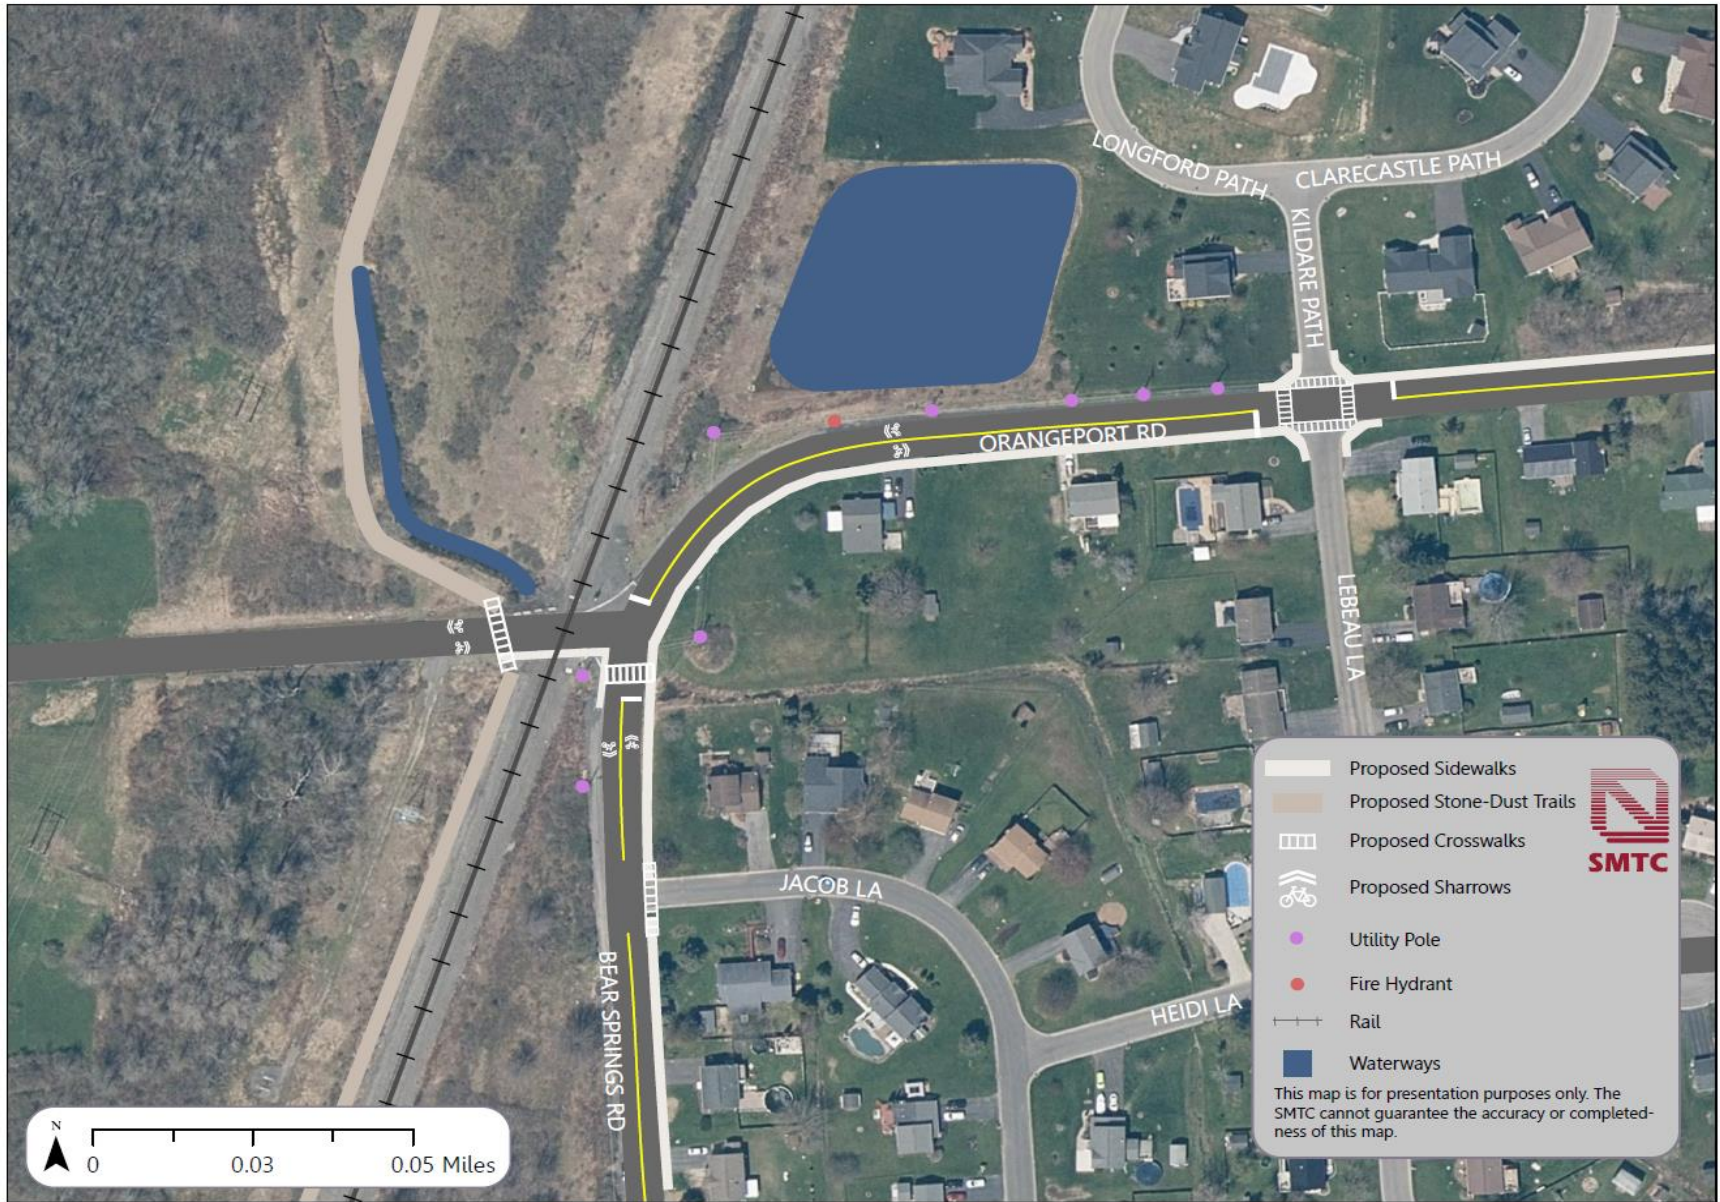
Envisioned Conditions: Orangeport Road and Bear Springs Road
